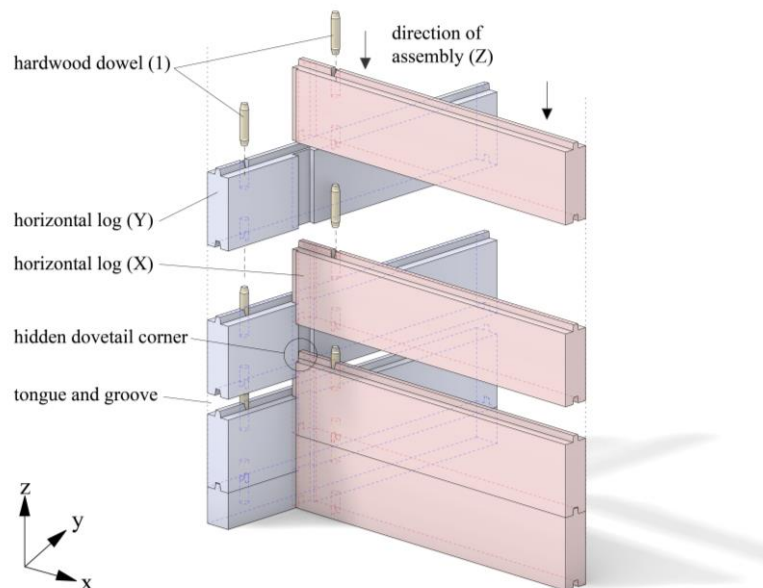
Piece by piece, the building was put together from bottom to top. In addition to the very precise corner joints, hardwood dowels were also installed in the construction, resulting in a very stable design.
